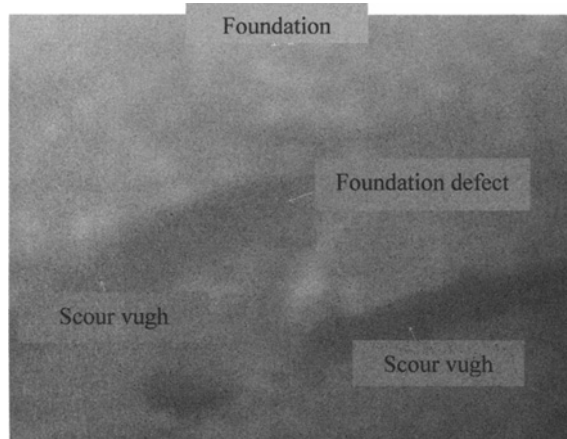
Underwater photo on water face of the foundation of No.4 pier
